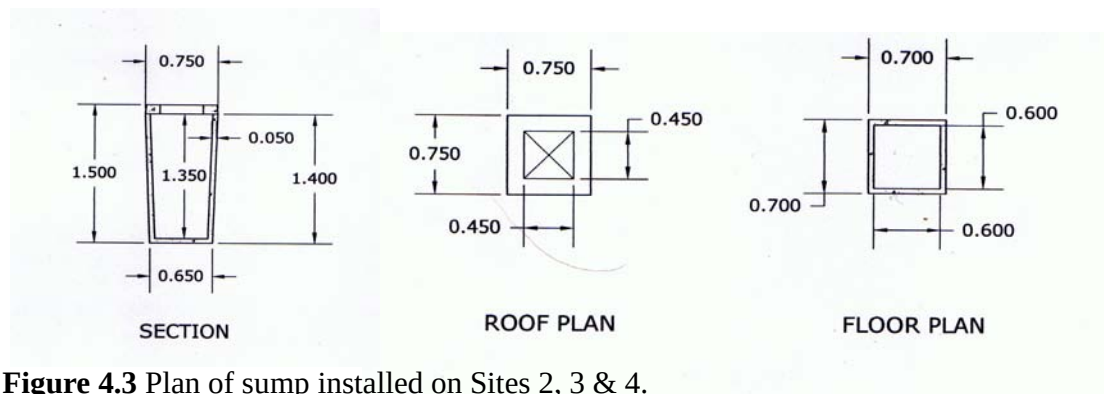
Plan of sump installed on Sites 2, 3 & 4.
